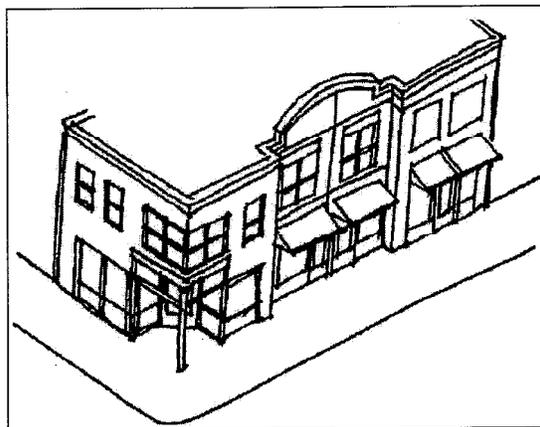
Aligning front walls of a new structure flush with the sidewalk edge creates a consistent visual line along the street.
